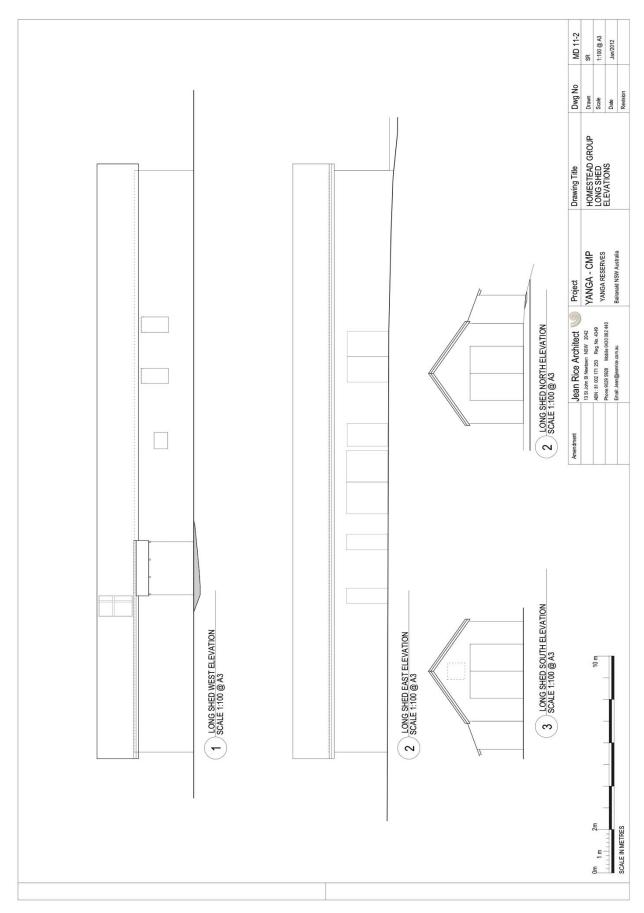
Homestead Group Long Shed elevations. Jean Rice Architect, site assessment 2009.
